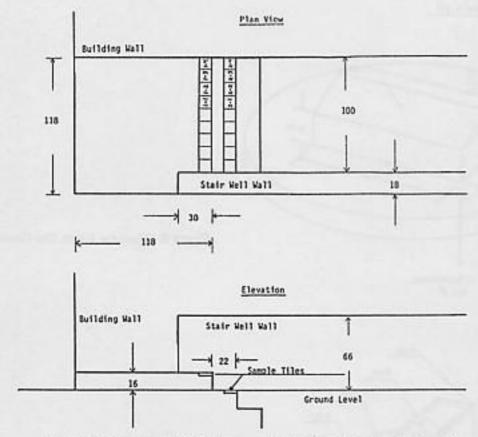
Chugoku Electric Company detail. Sample location 2-01, stair well (dimensions in cm)
